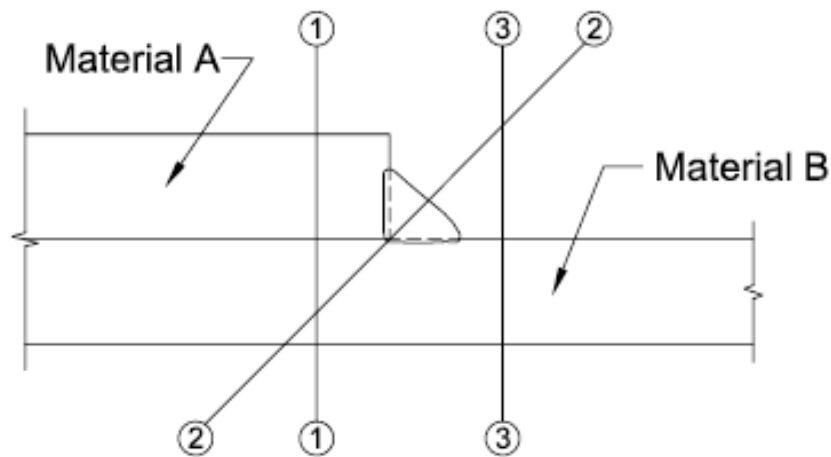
Shear planes for fillet welds loaded in longitudinal shear.
